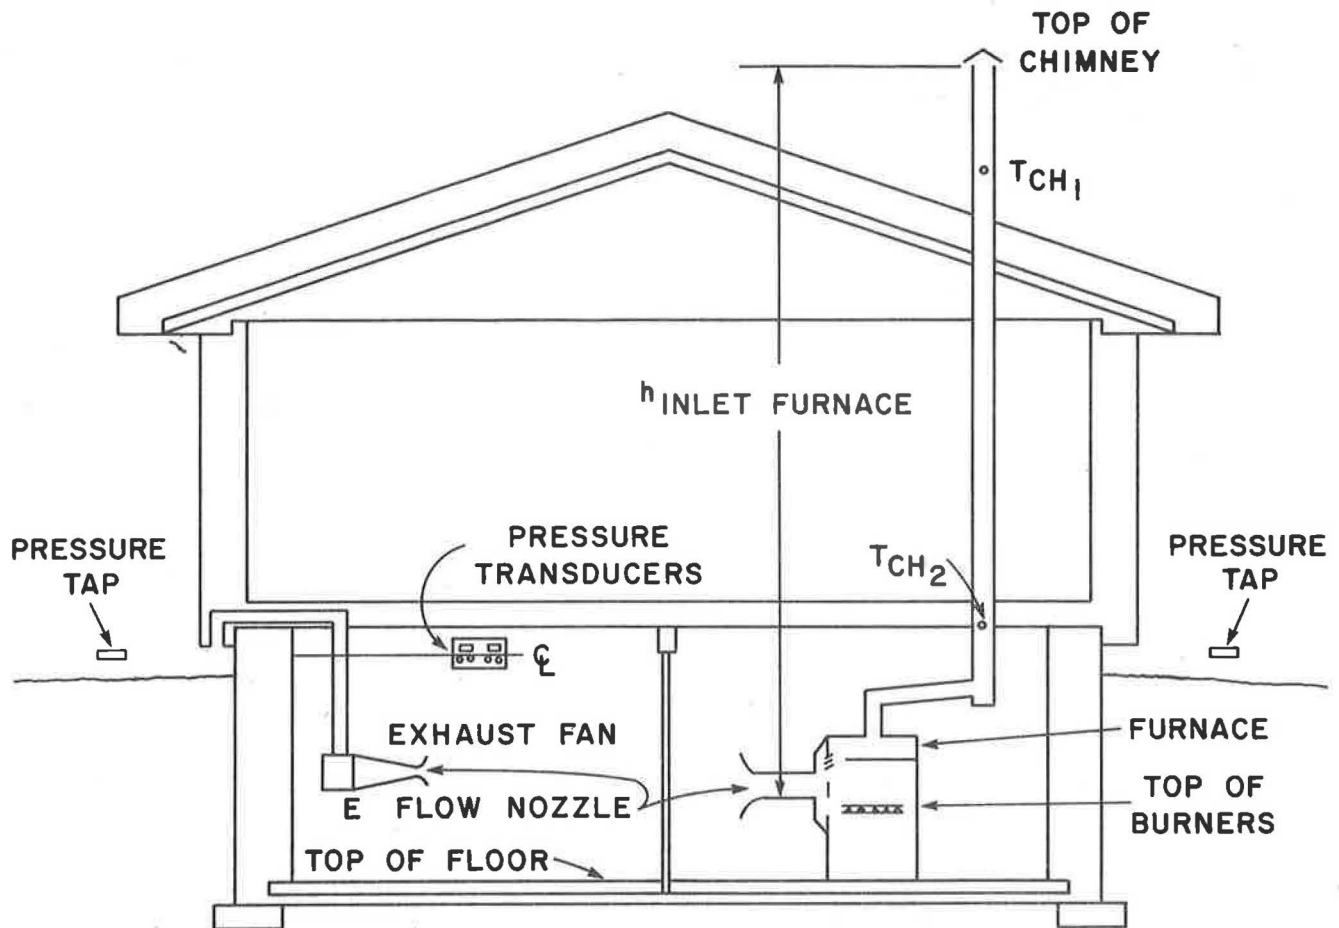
Cross section of house showing furnace, chimney, and exhaust fan
